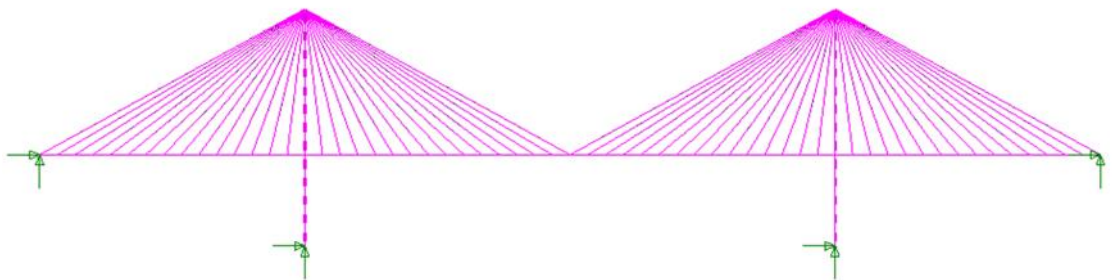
Cable stayed bridge fan system with pylon height 80m
